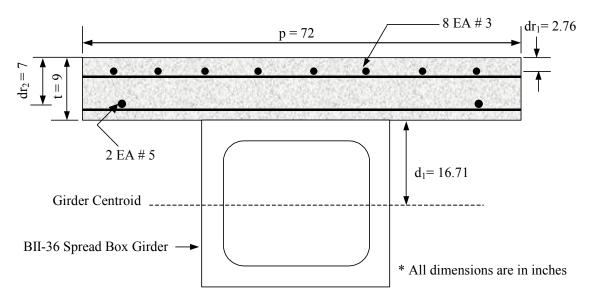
Geometry and reinforcement arrangement of the deck section supported on PC spread box girders
